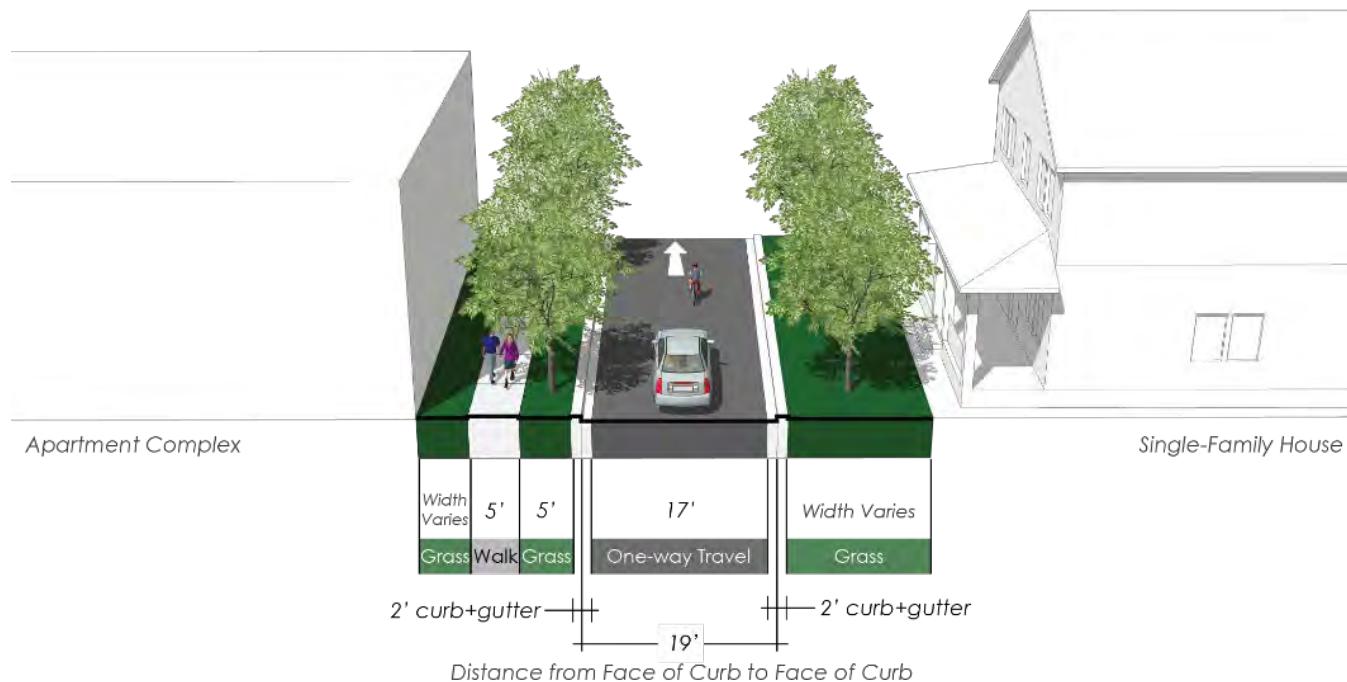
Pearl Street –Sleaford Road to Chase Street (Looking North)
